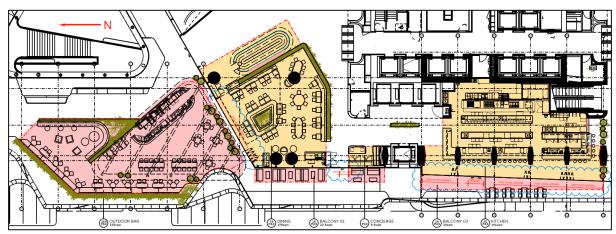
Proposed indoor and outdoor areas for the food and drink premises use, with outdoor areas in pink shading and indoor areas in yellow shading. 160 patrons are proposed within the northern outdoor terrace and 32 patrons are proposed within both balcony areas along the western corridor. Areas shown in white are common circulation space, which will be used as trafficable area for the proposed use.
